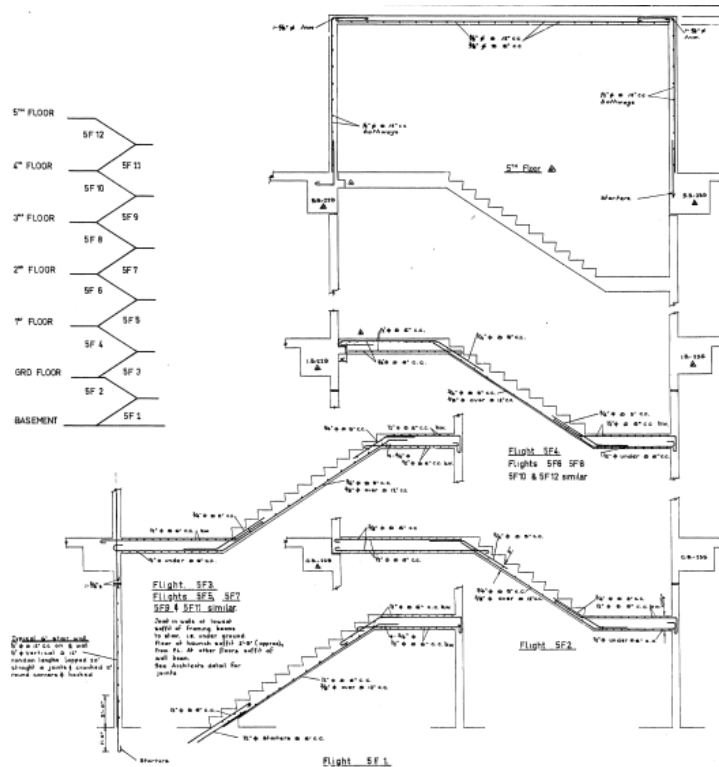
Stair Details - Galbraith Block Stage 2 Building
